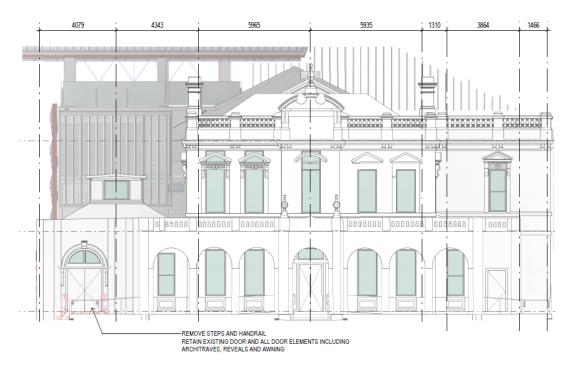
Western elevation existing (Source: Architectural Drawing No. AR-DA1-2000, Rev C)
